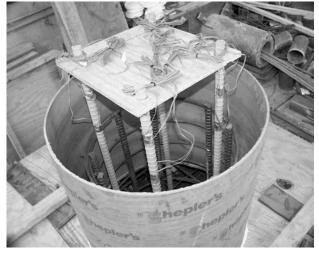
Cast-in-place Column Bent—Precast Cap (Vertical Duct)
